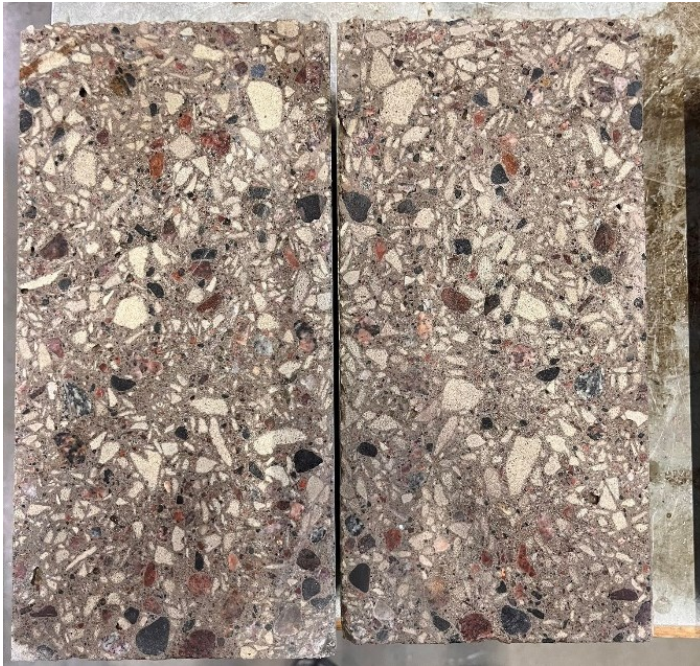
Cross section of the specimen when vibrating the whole mixture in the mould with a mechanical vibrating rod.
